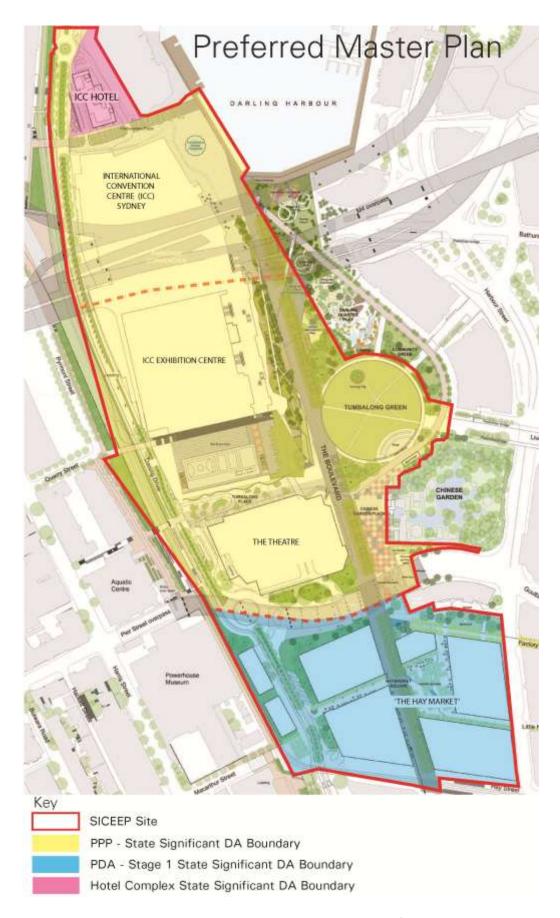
Masterplan showing the study area and the proposed location of buildings.
